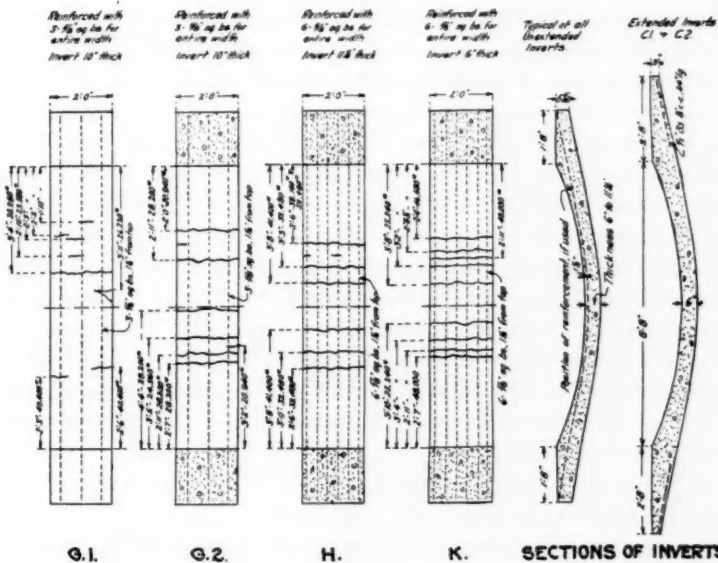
B. POSITION OF CRACKS IN TEST INVERTS AND LOADING CAUSING EACH CRACK
